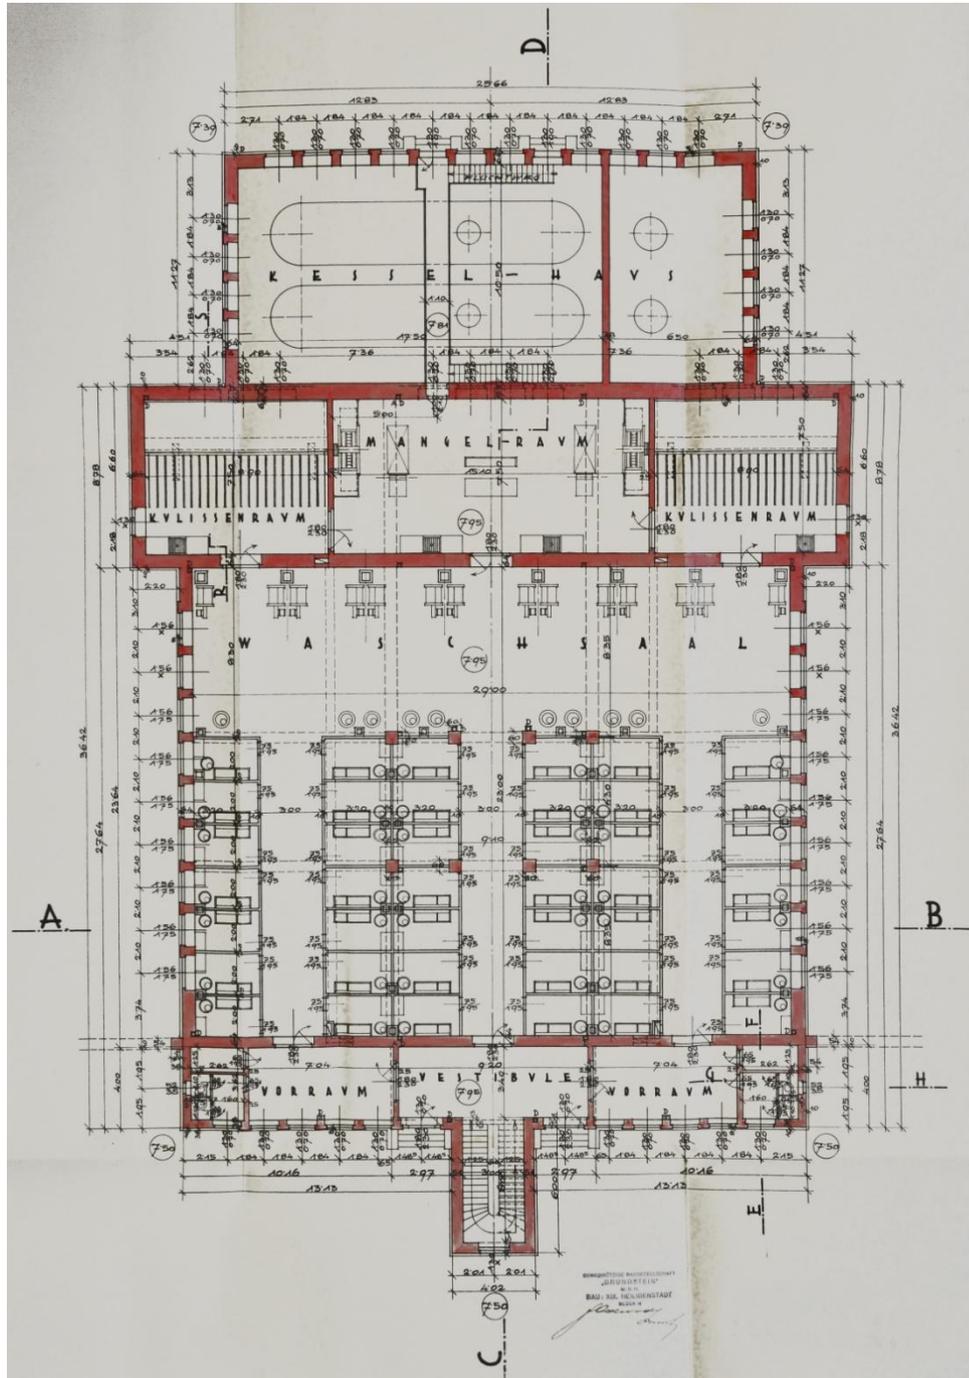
Groundfloor Plan of Central Laundry-Bath Building
